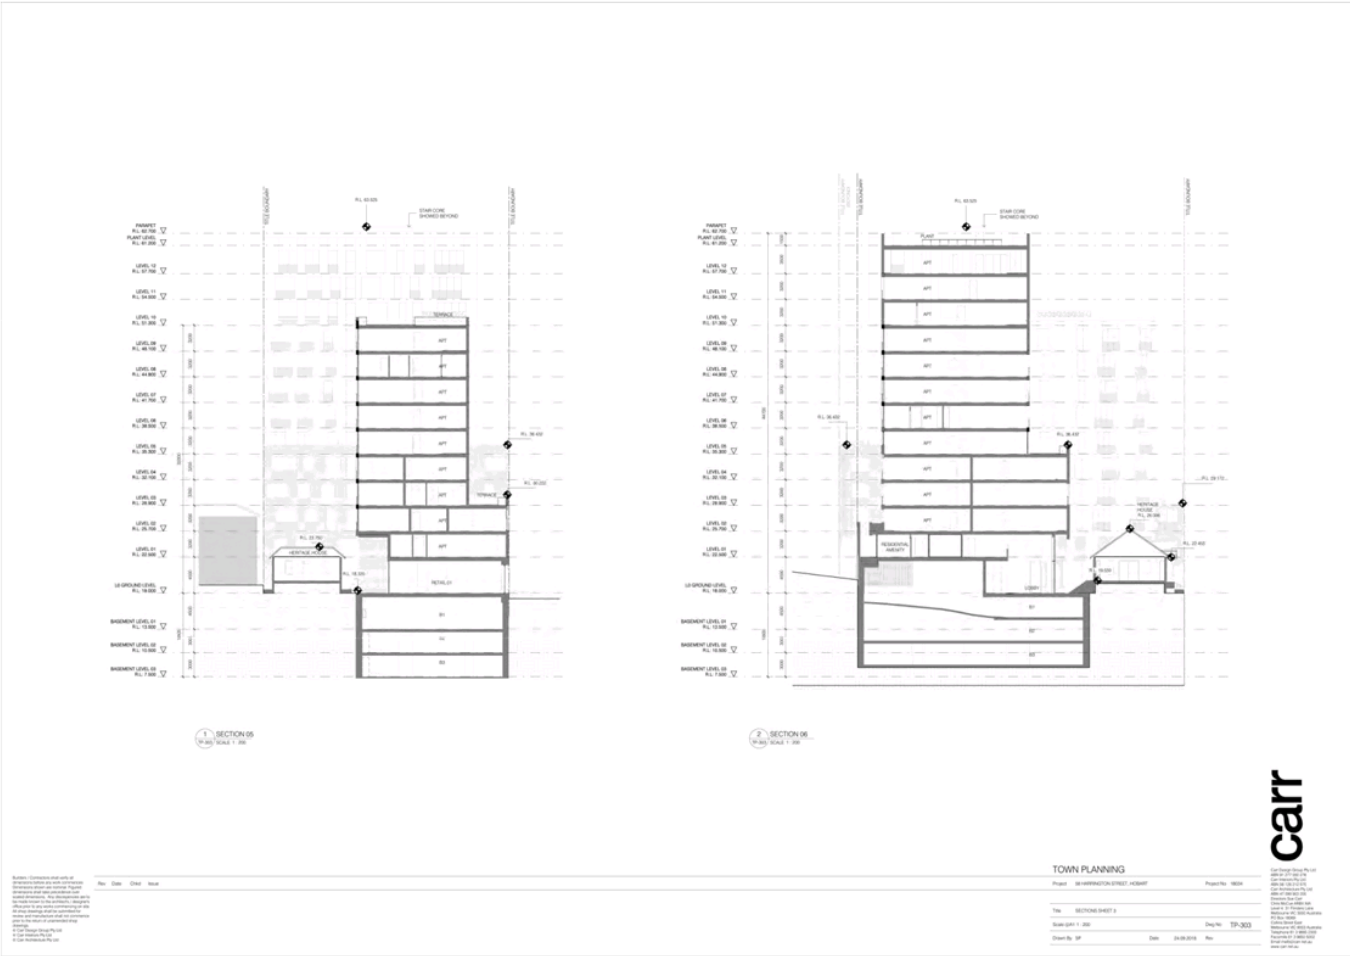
Section, showing car park basements in relation to house at 59 Davey Street
